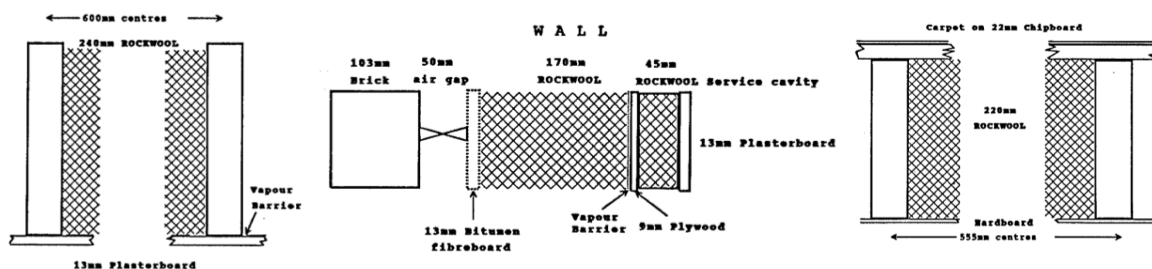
Cross sectional constructions of (left to right) ceiling, external wall and floor.
